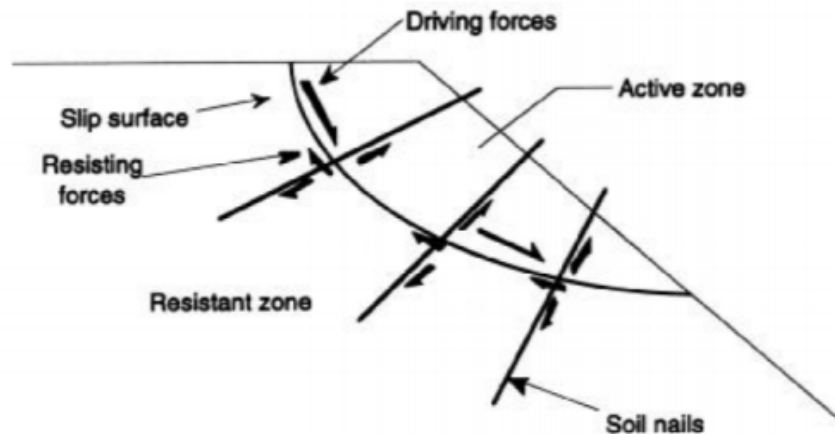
Slope repair using soil nails (FHWA, 2003; Titi and Helwany 2007)
